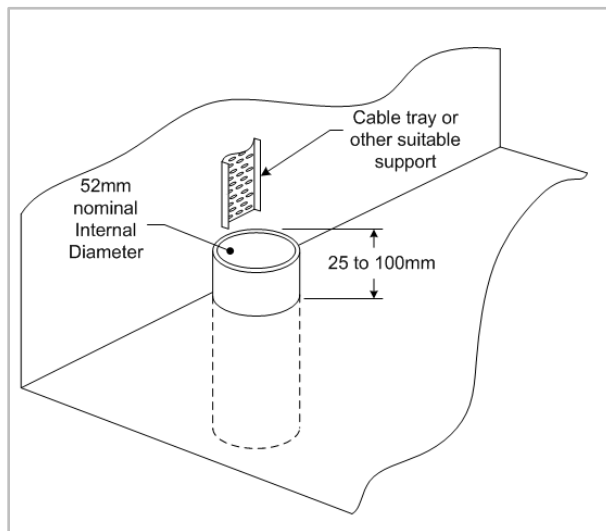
Sleeve example telecommunications riser/closet floor or ceiling entry
